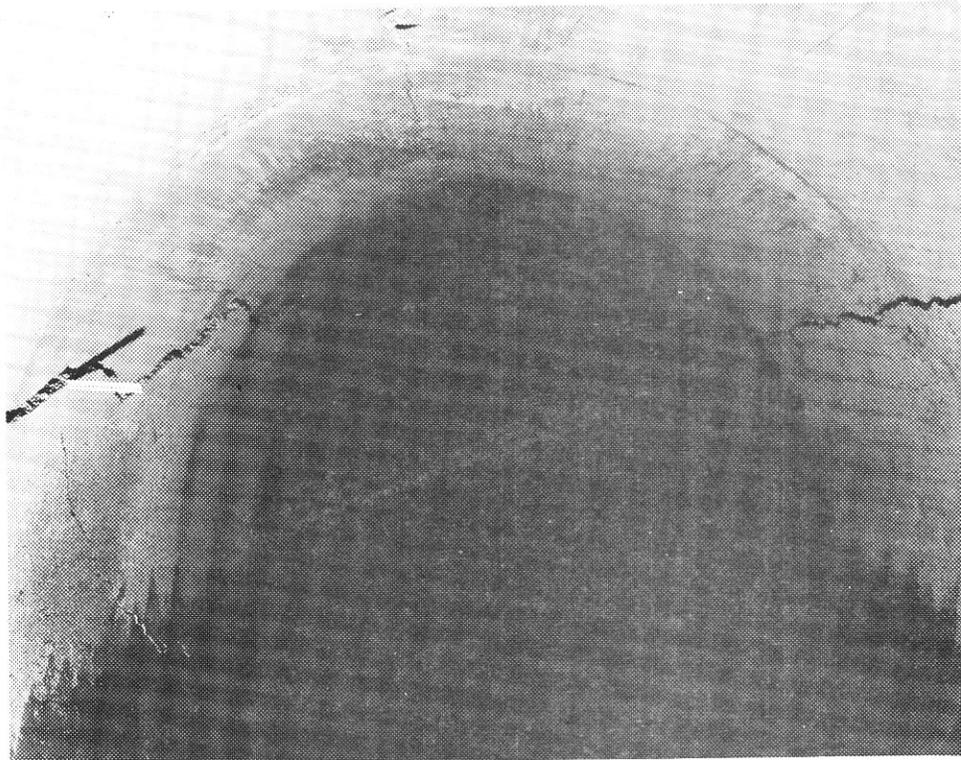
Typical longitudinal cracks in 84-inch concrete pipe.
